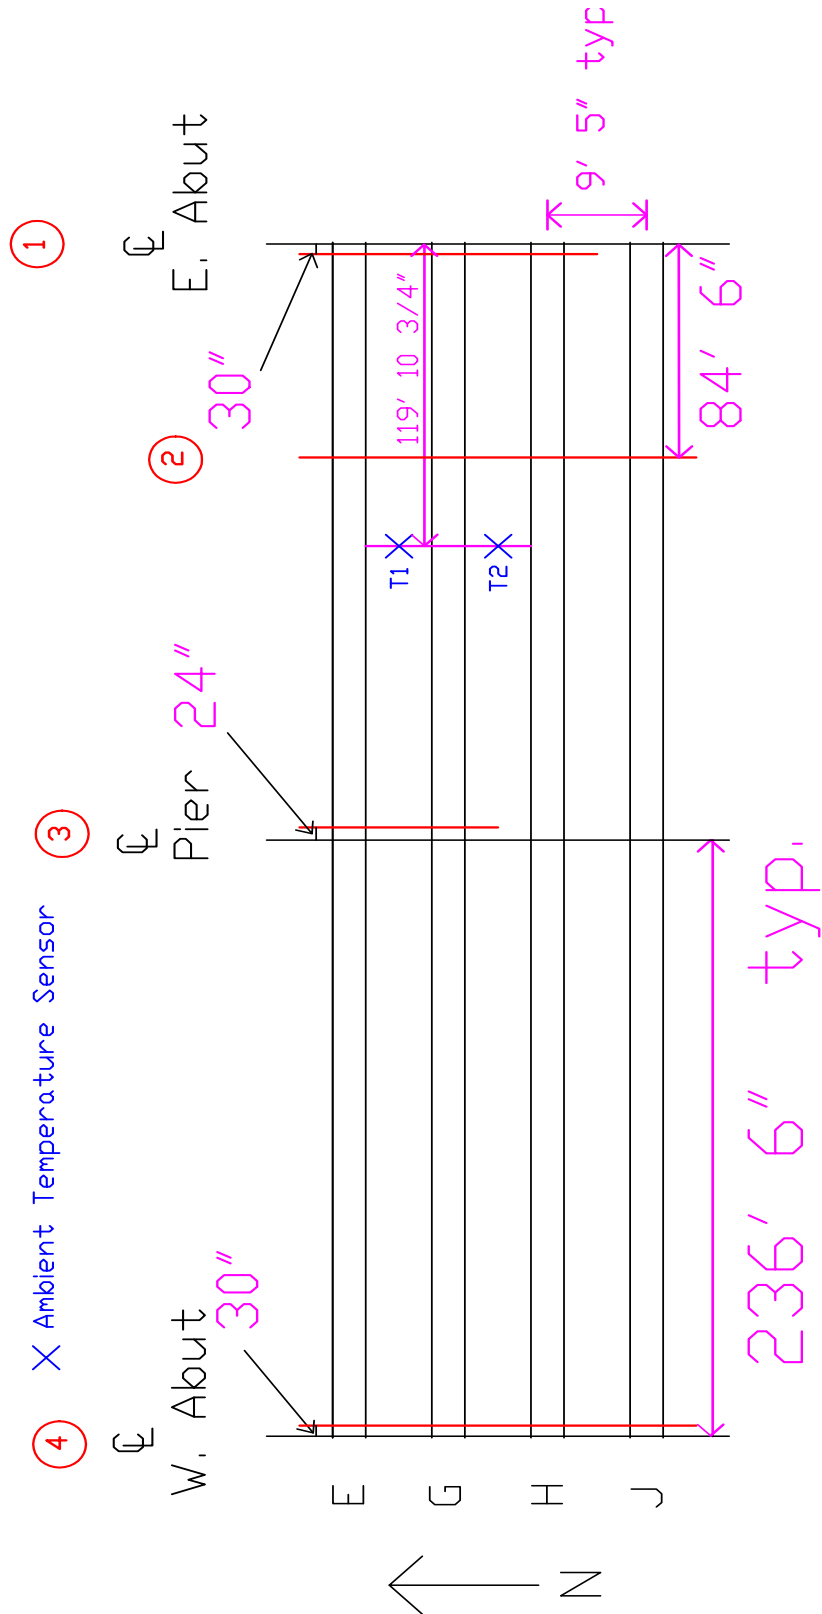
Sections for spot-weldable steel strain gages for Phase I. Sections 1 and 4 are at the abutments, section 2 is at the maximum positive moment, and section 3 is at the pier
